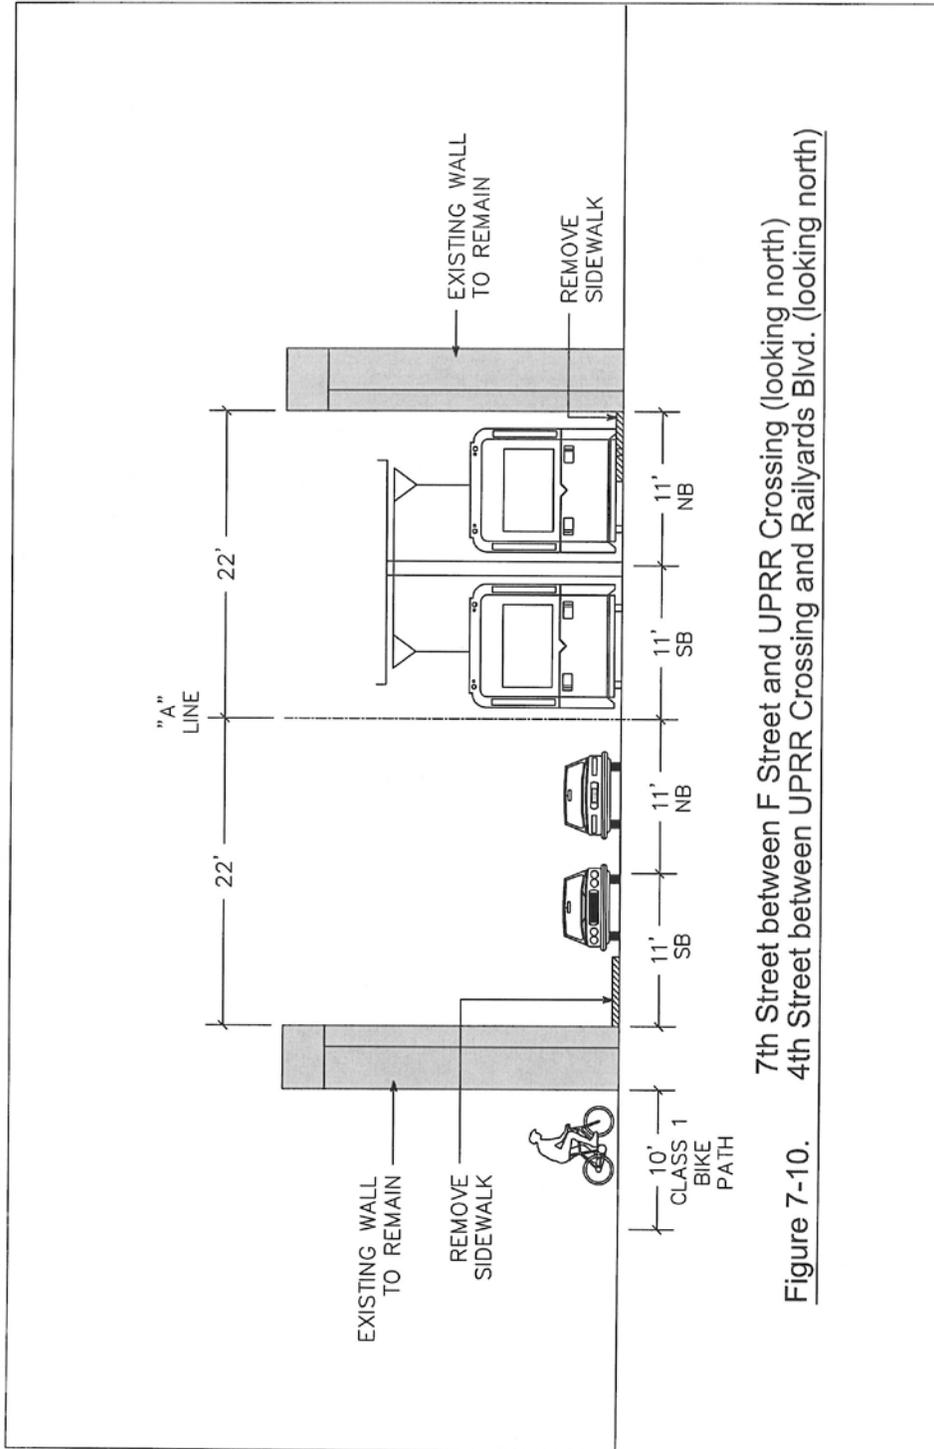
7th Street between F Street and UPRR Crossing (looking north)
